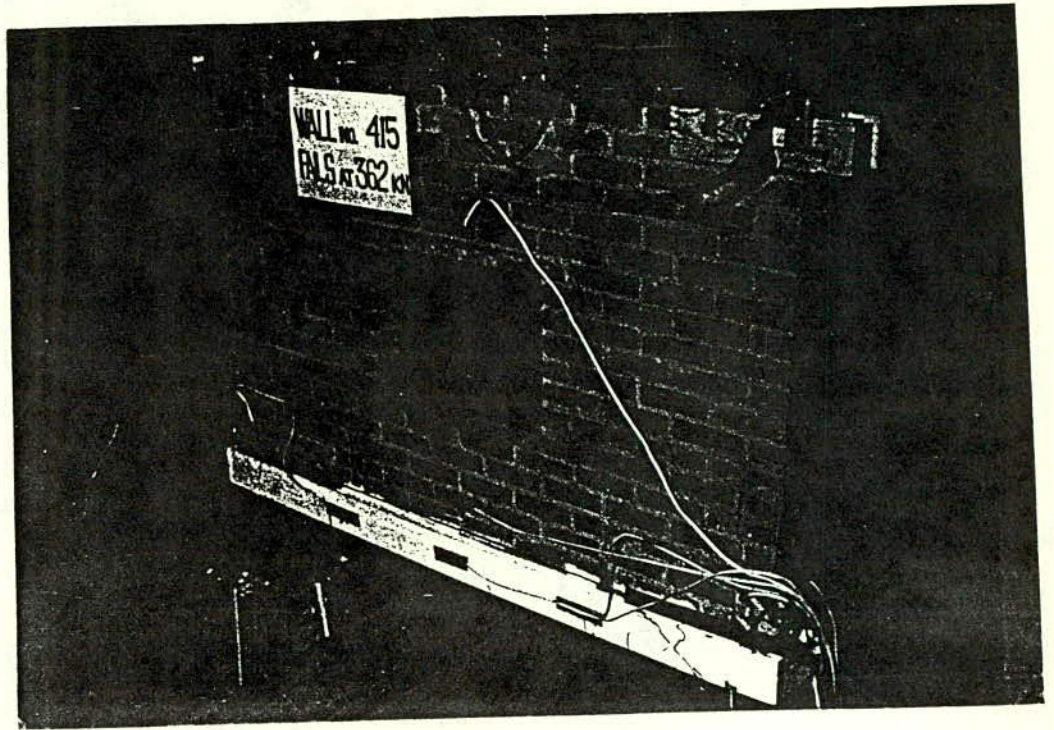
(a) Failure of Wall-beam Panel with opening (back side)
